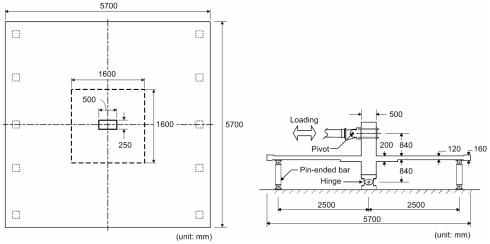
Interior slab-column connection specimen with drop panel and its dimensions
